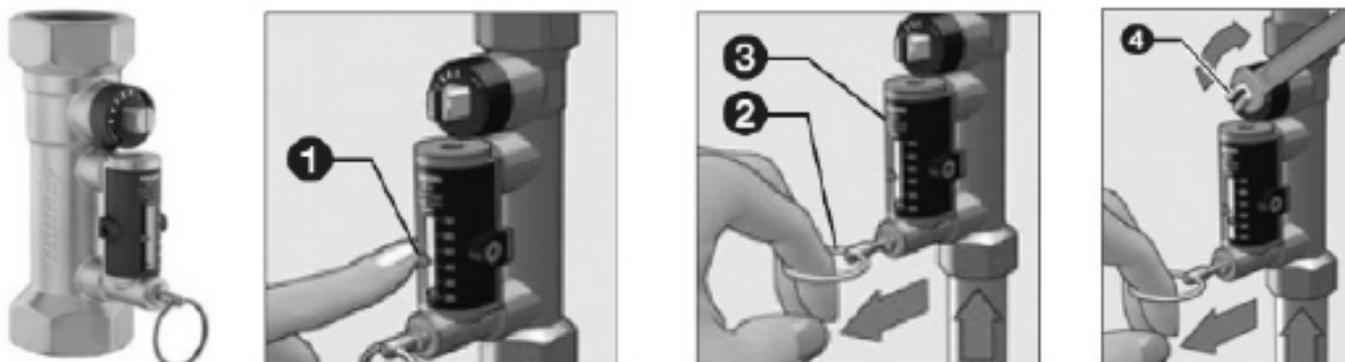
balancing valve with flow meter adjustment: set red indicator to reference flow rate (1), pull the ring to open the obturator.
